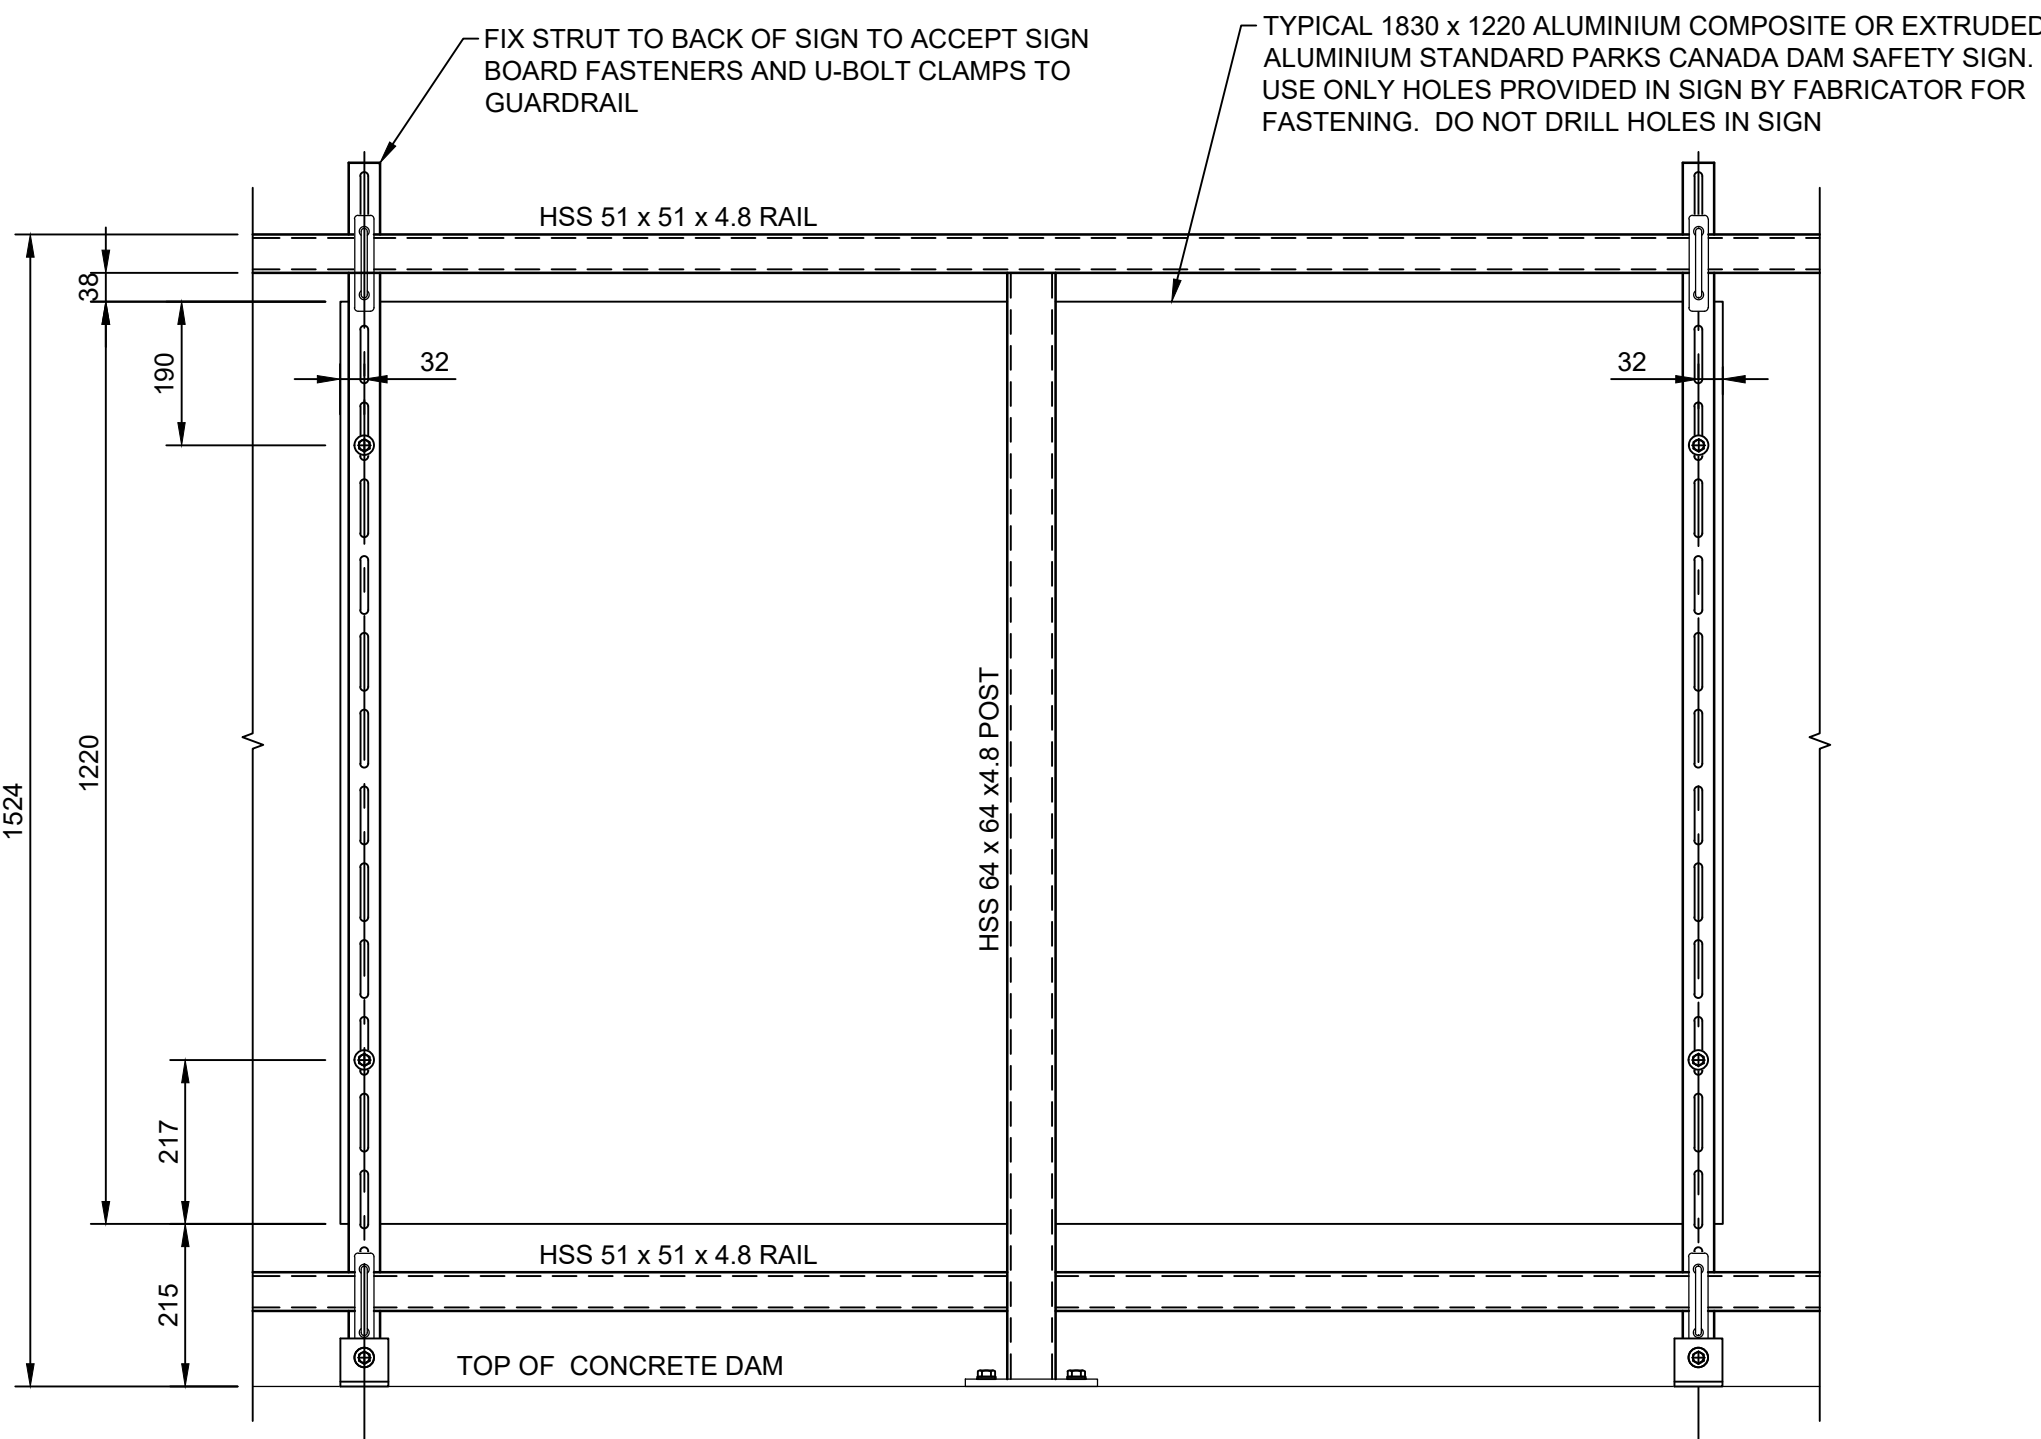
HIGH GUARDRAIL DETAILS
